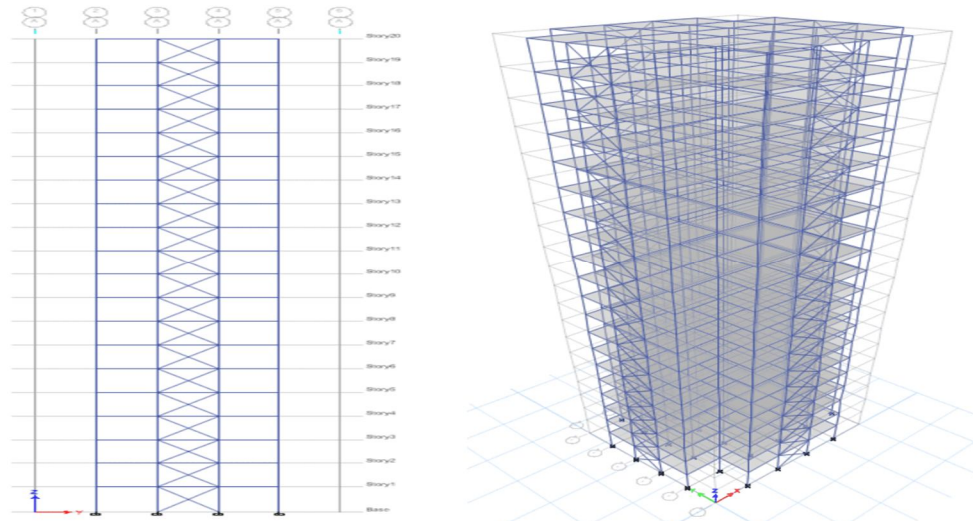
Elevation and 3D view of Irregular building with cross bracings at centre on each side
